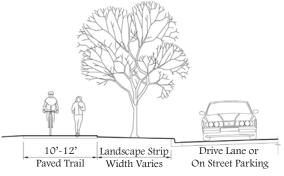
Roadside Greenway Trail/ Sidewalk
